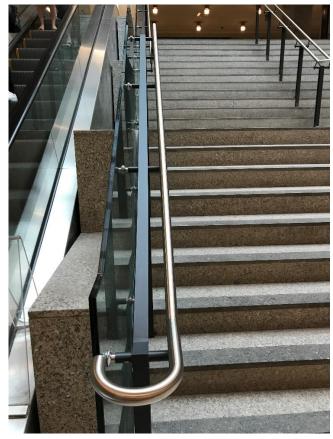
Example of curved handrail connecting to metal posts, glass partition, and granite walls
